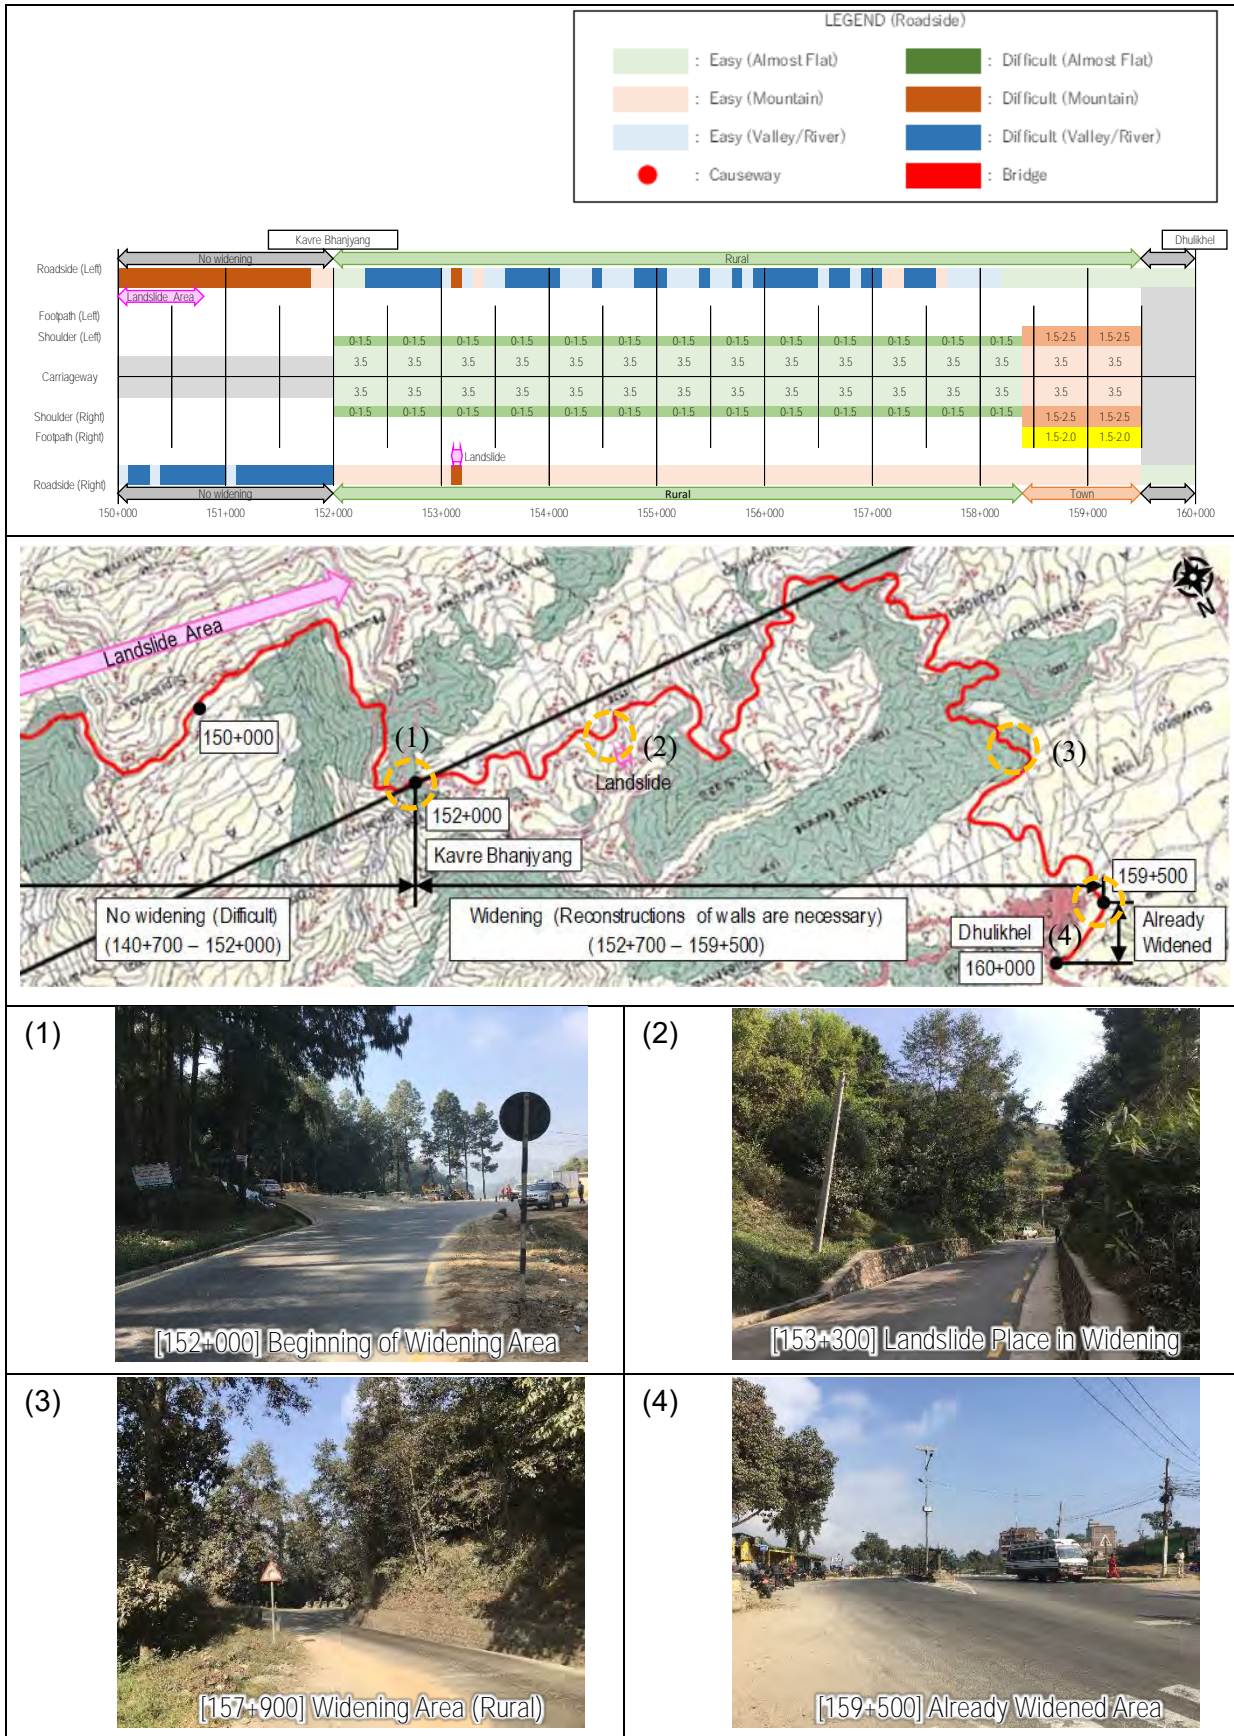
Example of Application of Cross Section Type (Ch.150-160km)
